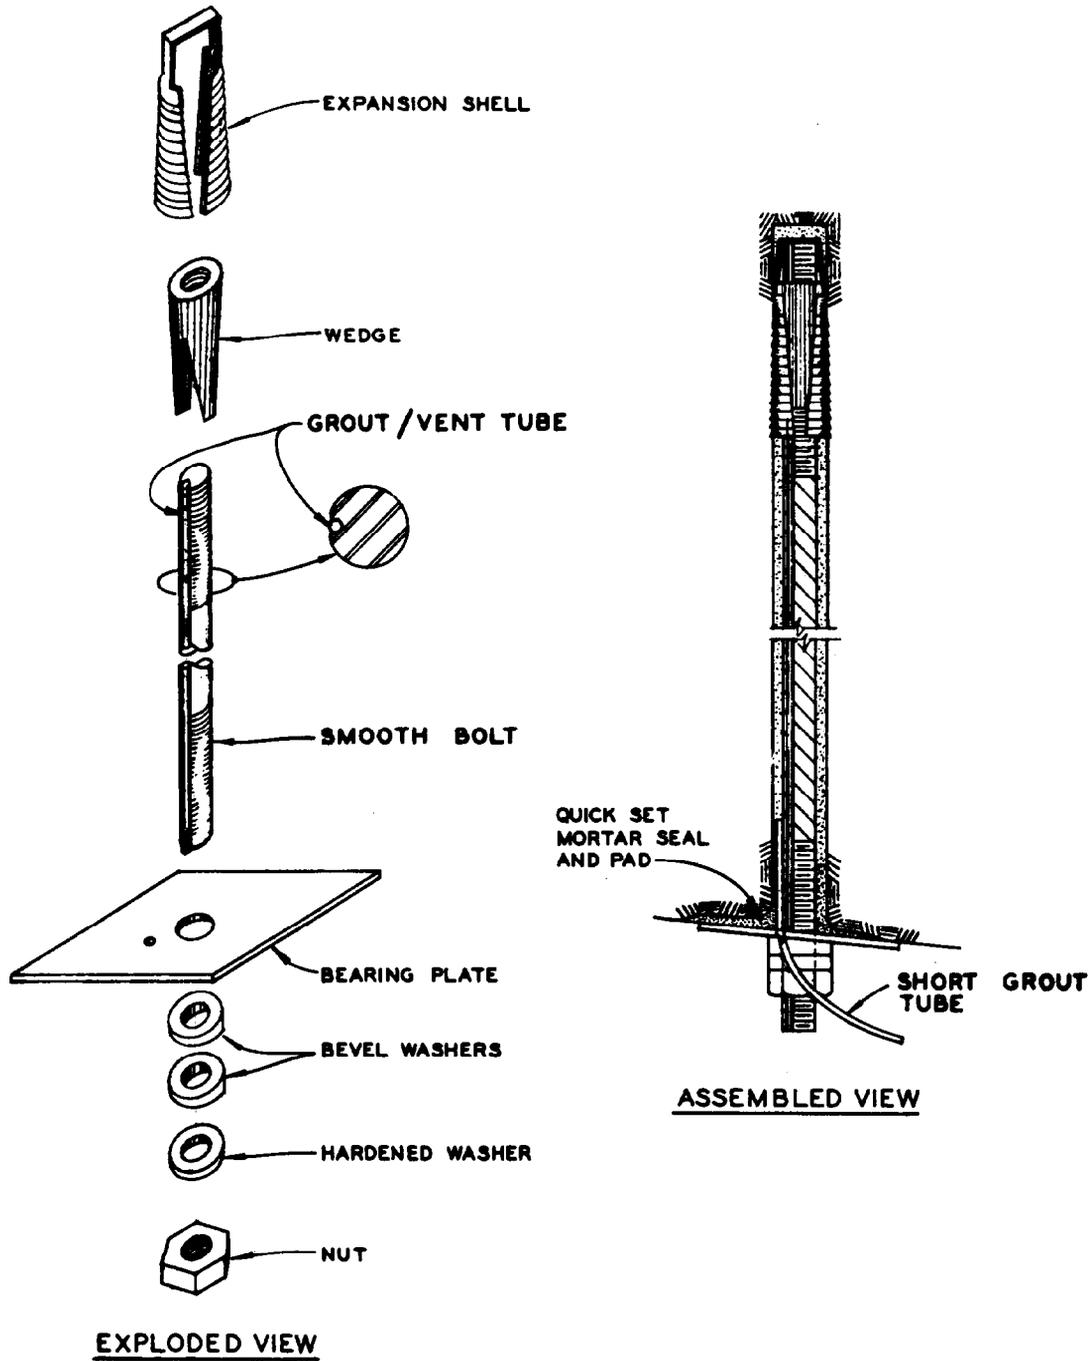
Groutable smooth bar rock bolt with integral grout tube.
